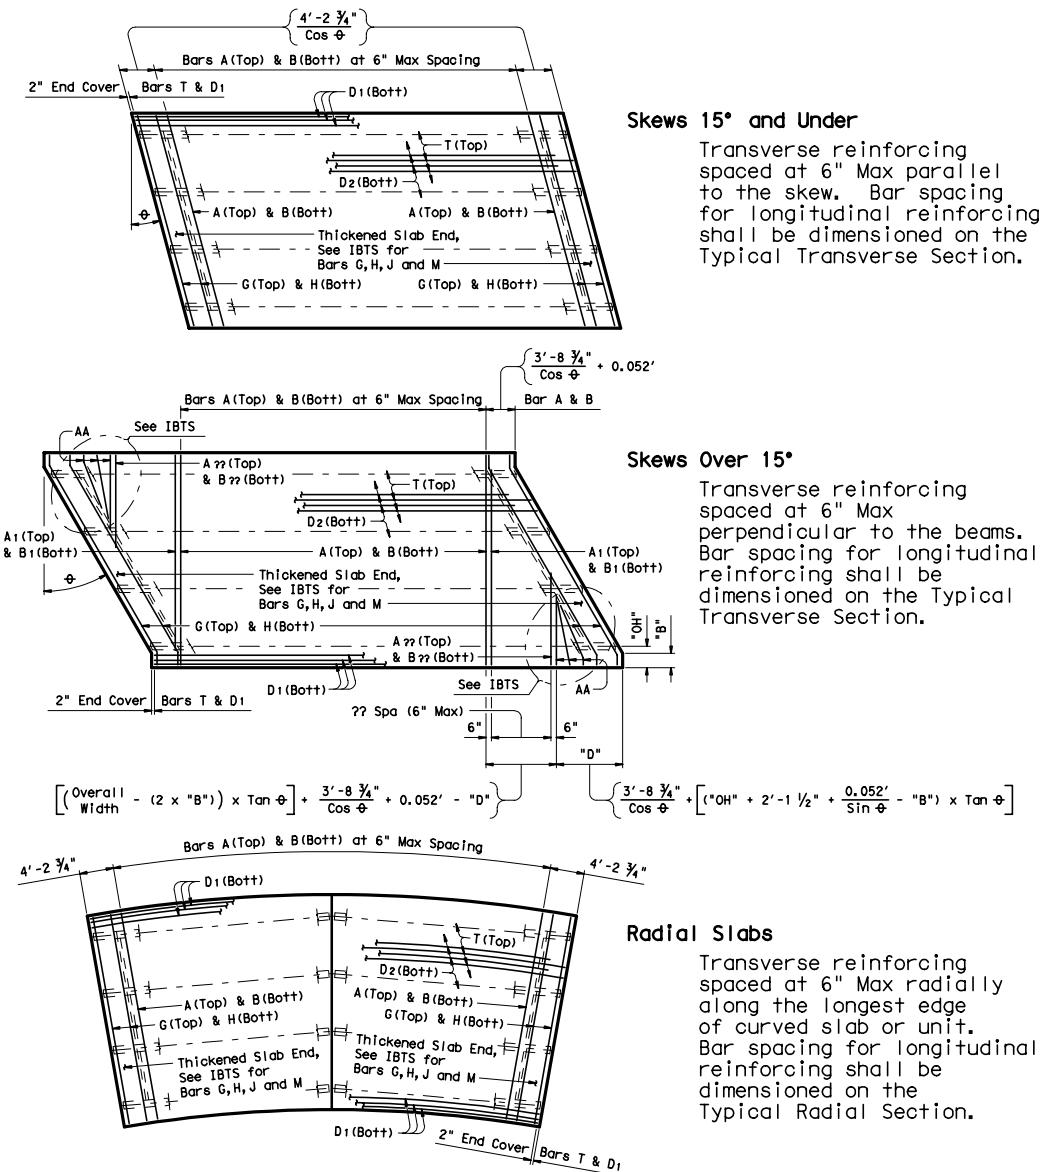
Typical Plan Reinforcing. Online users can click 5-18 to view this illustration in PDF.
